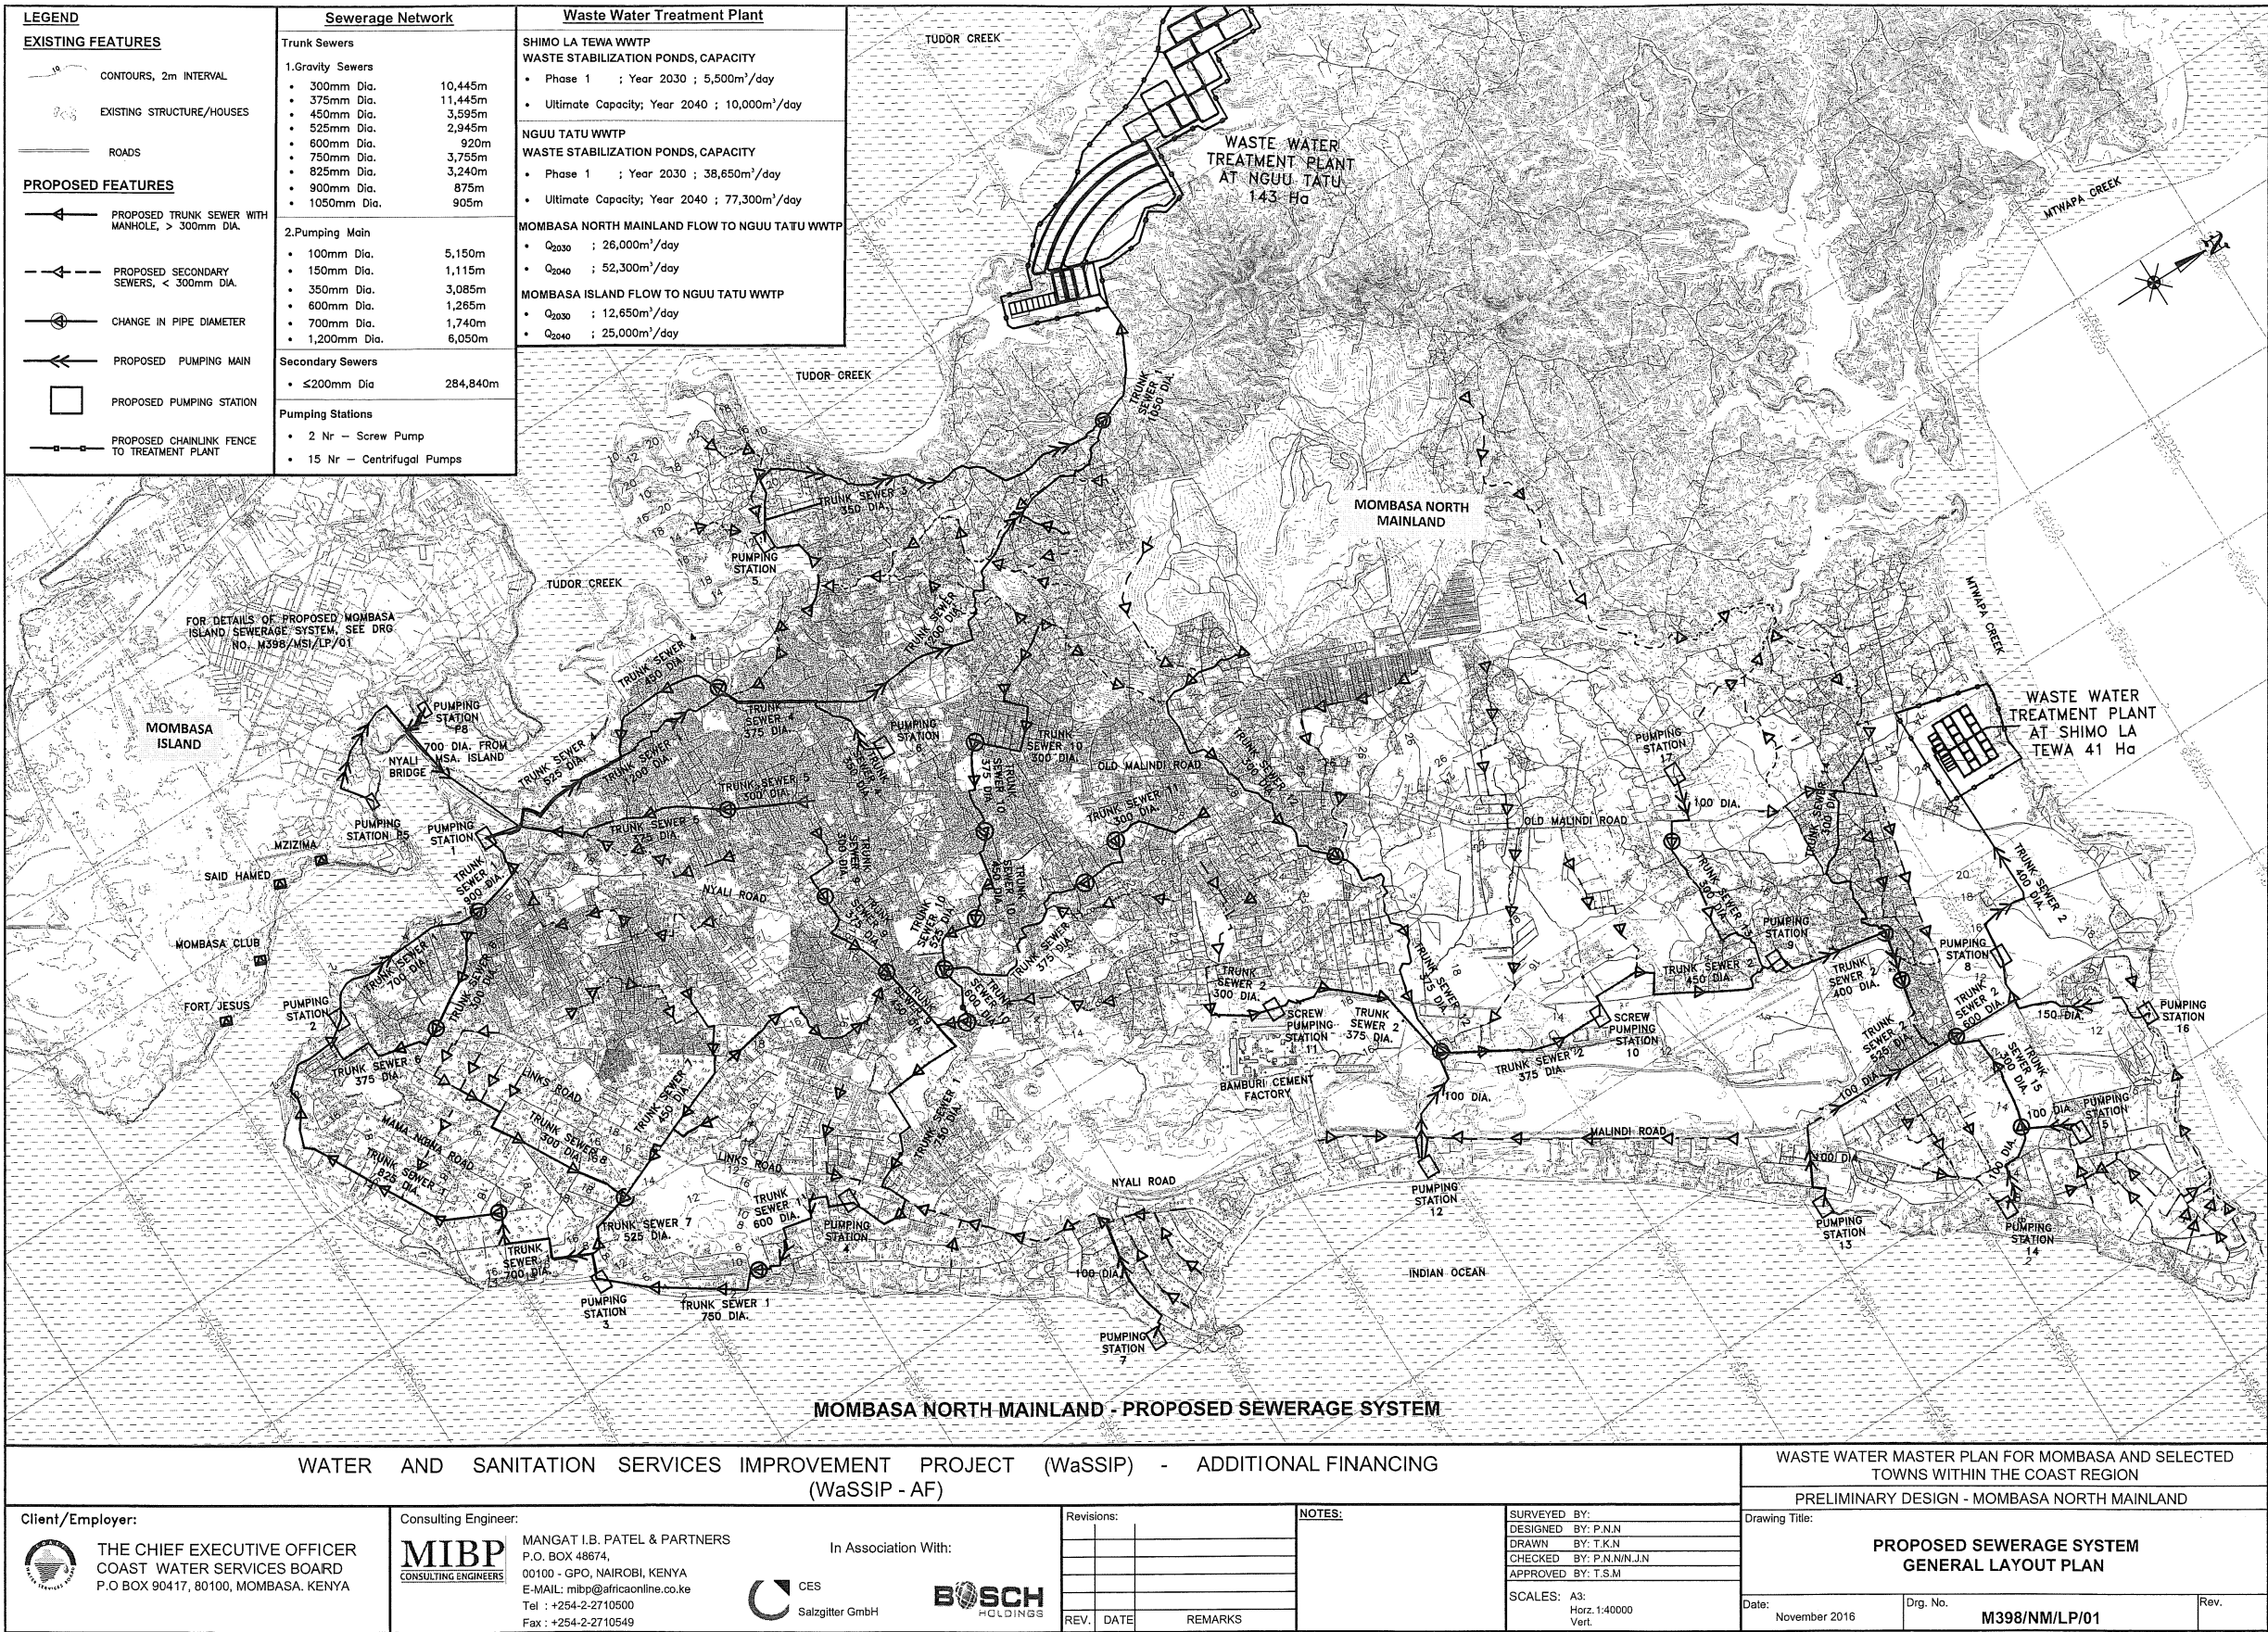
Detailed Layout of the Sewerage System – Mombasa North Mainland
